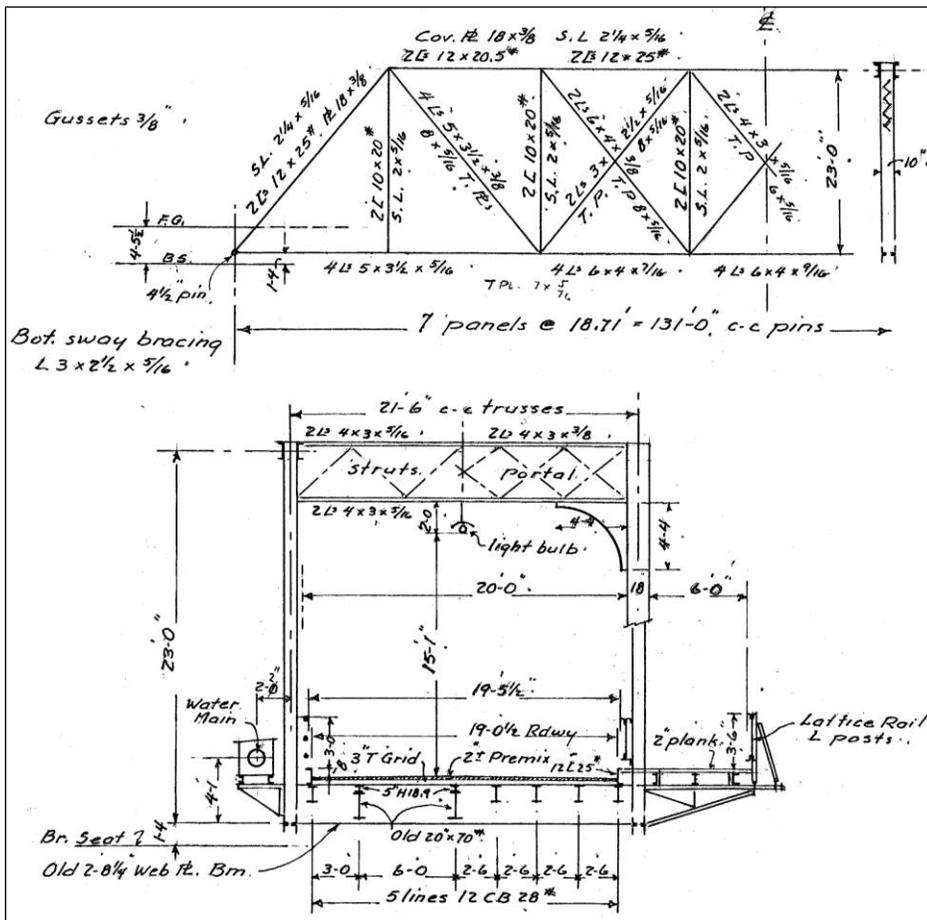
Claremont 091/118, Plains Road over Sugar River (1906). Section & elevation sketch (NHHD Bridge Inventory Card).
